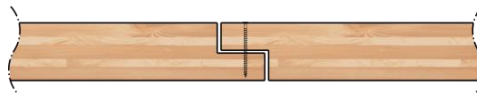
Cross section of the CLT floor with the lap joint and screw connection
